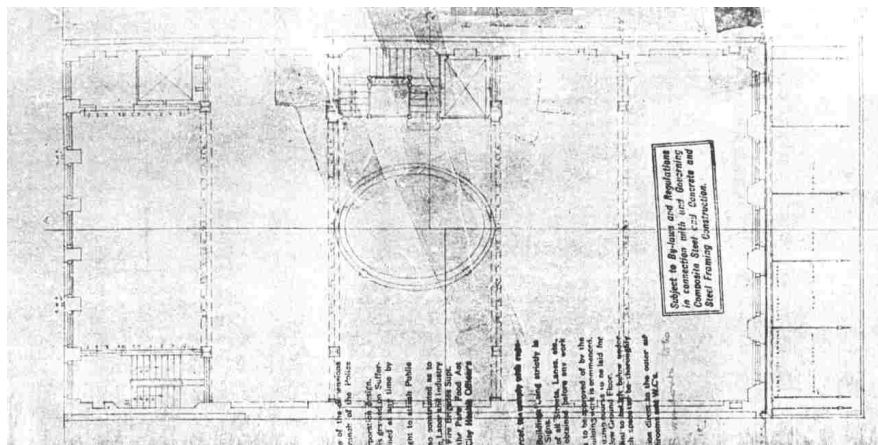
First floor plan by Wilson, Neave and Berry, 1922 (Source: City of Sydney Archives, BA 74/22)
